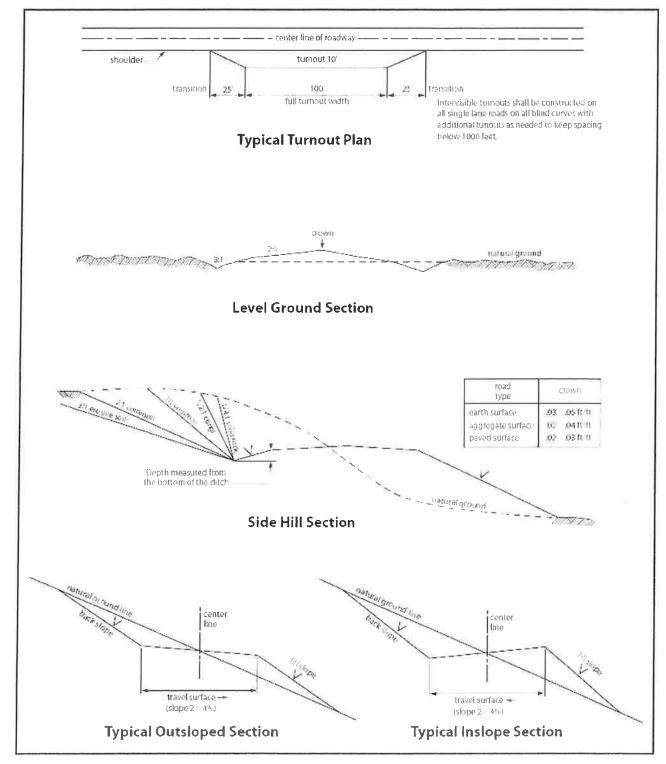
Cross-sections and plans for typical road sections representative of BLM resource or FS local and higher-class roads.
